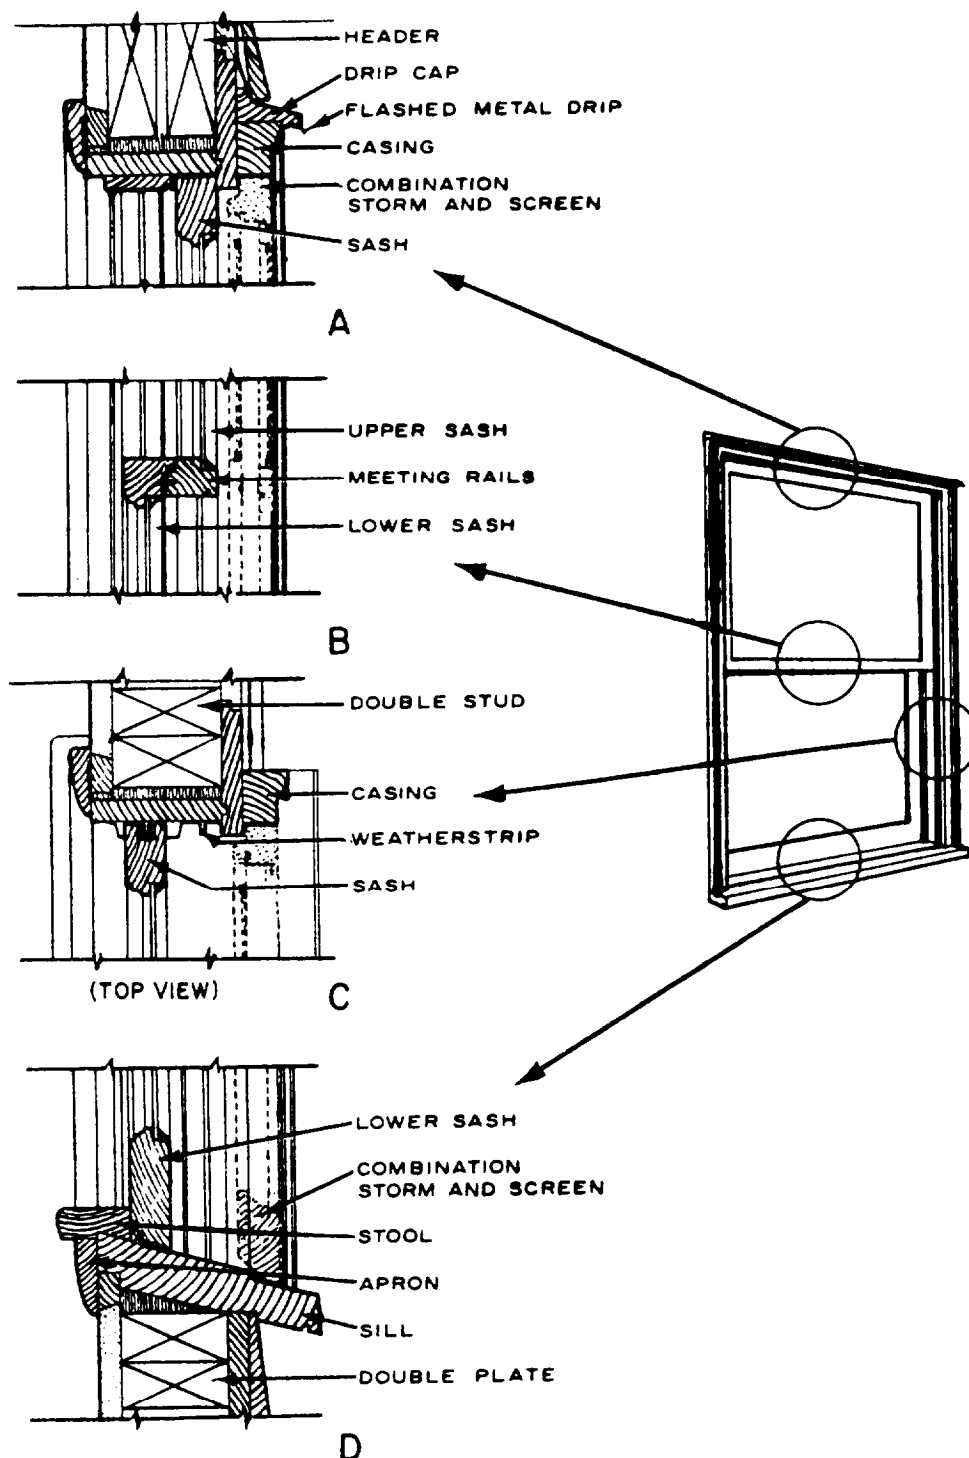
Double-hung windows. Cross sections: A. Head jamb; B. Meeting rails; C. Side jambs; D. Sill.
